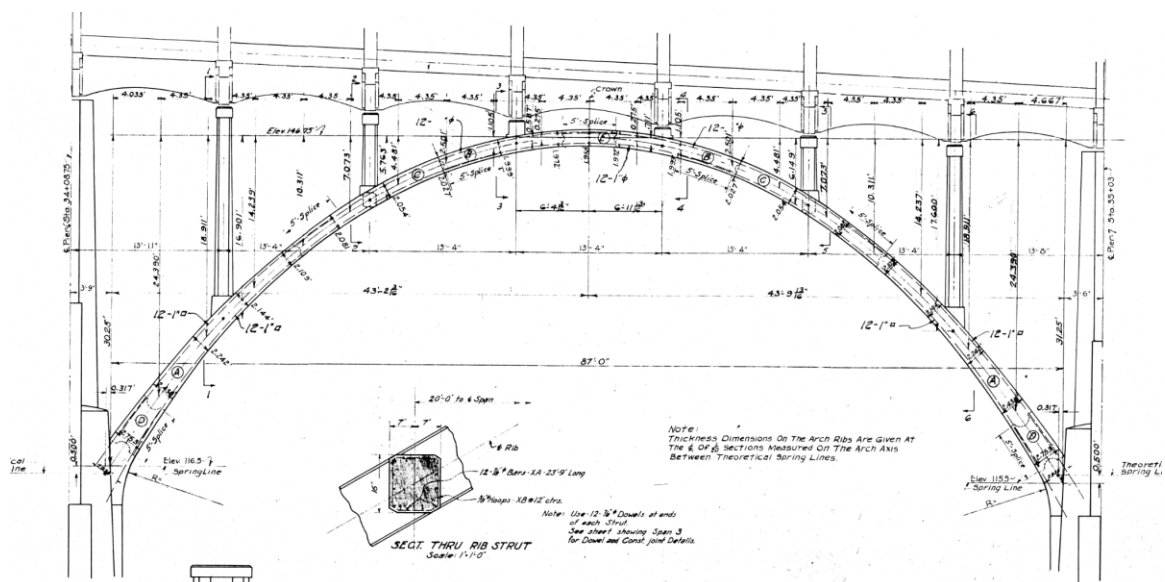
Longitudinal view of bridge: technical drawing.
